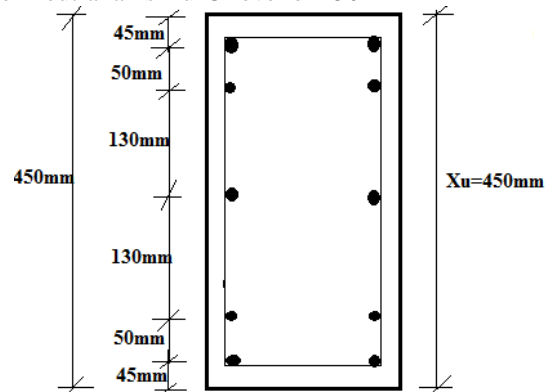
Column section with unequally spaced longitudinal reinforcement
